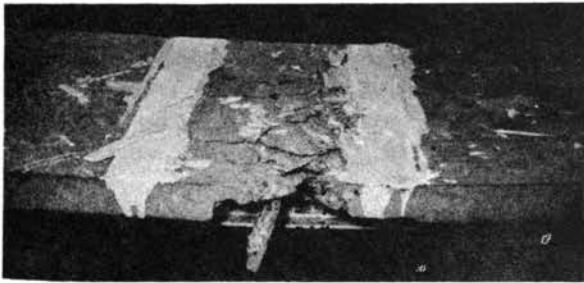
Beam 12 after removal from testing machine. Photo shows typical top view of specimens which failed in flexure.
